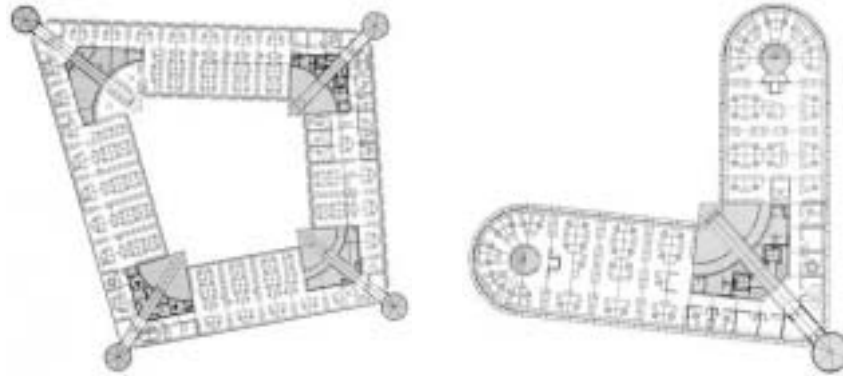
The Inland Revenue Headquarters in Nottingham comprises six buildings built around a central amenity building. There are two typical floor plans (both open plan layouts): quadrangle (*left*) and L-shaped (*right*). The low-energy concept for the buildings called for narrow plans to maximise daylight and enhance the effect of cross-ventilation. Ventilation towers provide in addition a stack effect that draw air through the offices. The towers, extending over the stairwells located in each corner³⁴, are fitted with moveable fabric “top hats” that can control the airflow according to the climatic conditions.
